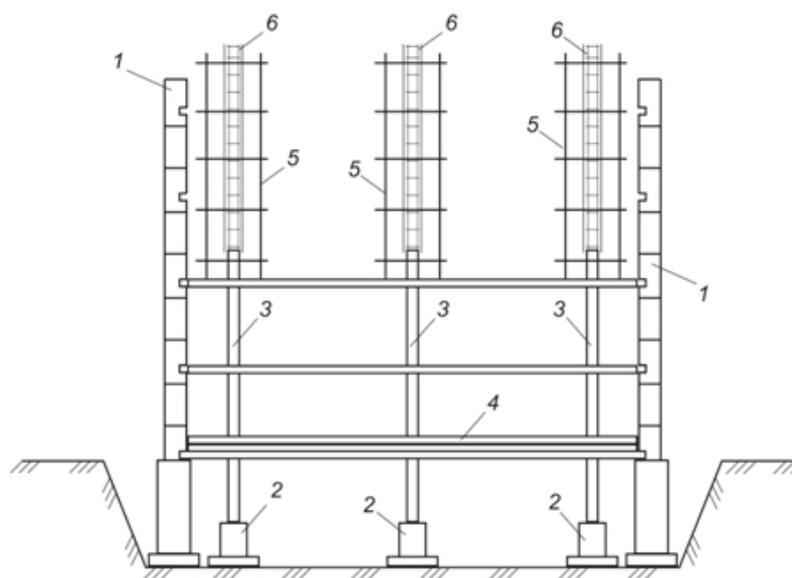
Embedded carcass installation with the floor lift technique (Concrete procedure for the second column tier):
